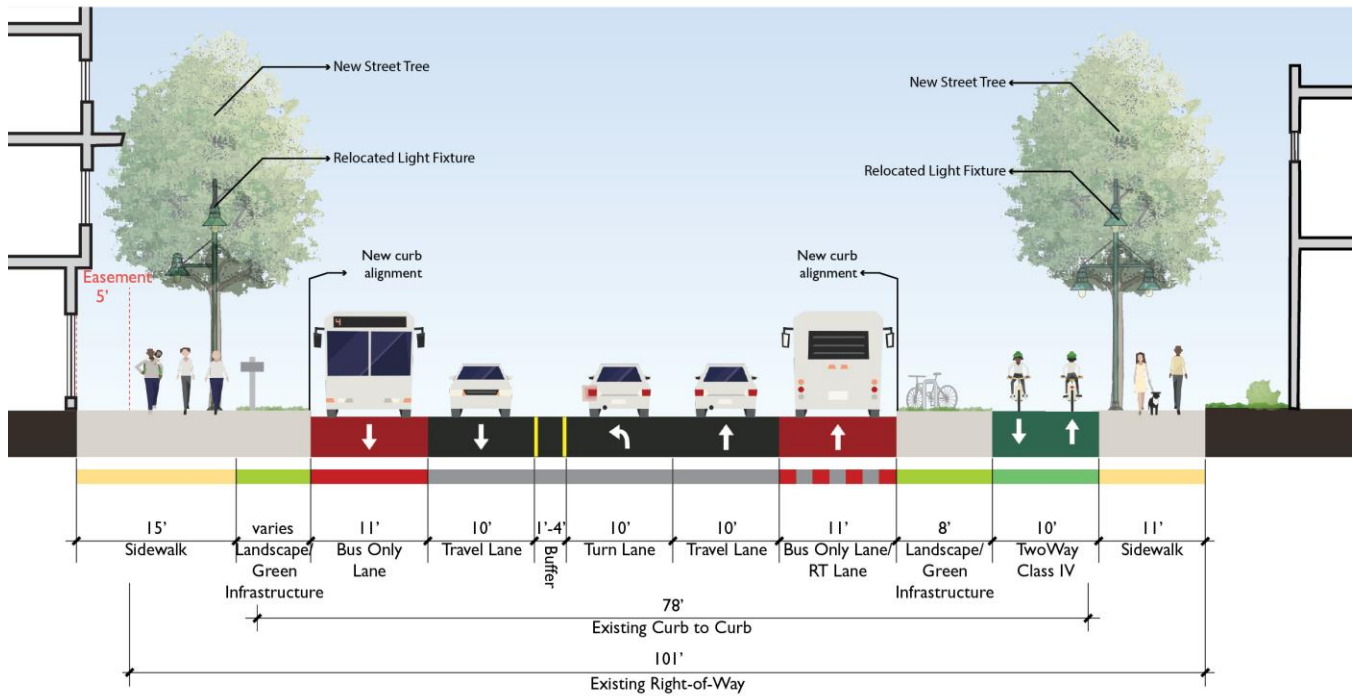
40th Street at San Pablo Avenue (looking west) – SECTION C
